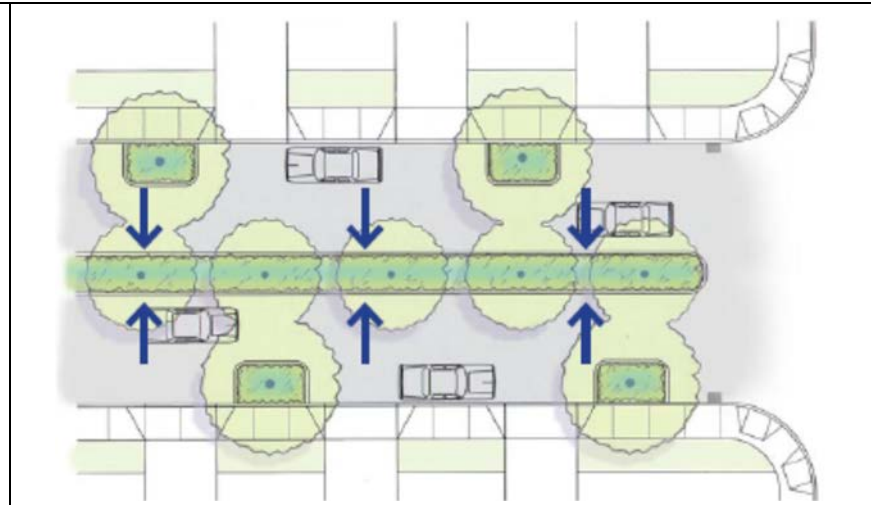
Reverse Crowned Street Profile. A reversed crowned street is the opposite of a crowned street and directs runoff to the center line of the street. GI facilities may be considered in the median.
